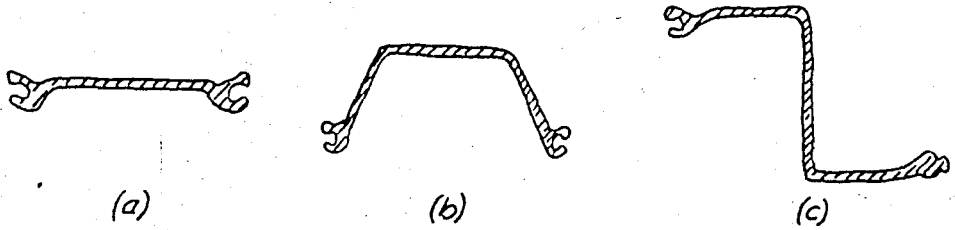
Types of Steel Sheet Piles Commonly Used for Bracing Sides of Deep Excavations. a-Flat Web, b-Arch Web, c-Z Piling. (after Peck, 1974)
